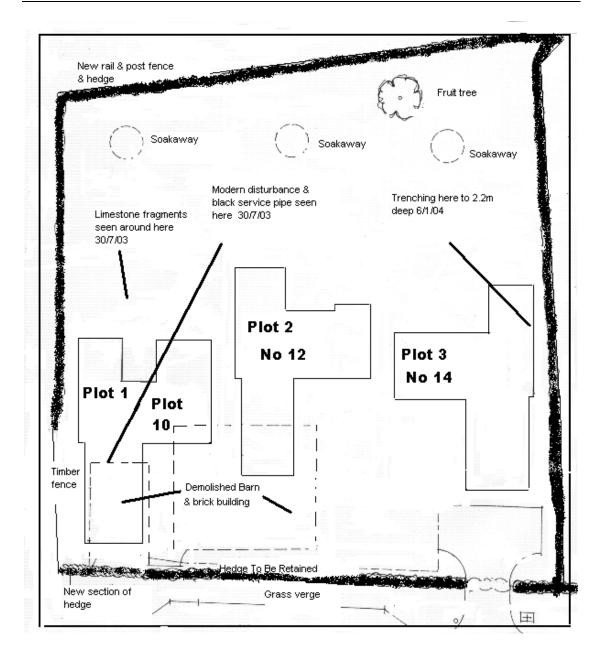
Location plan of proposed developments, showing features observed. Derived from plan provided by developer.
